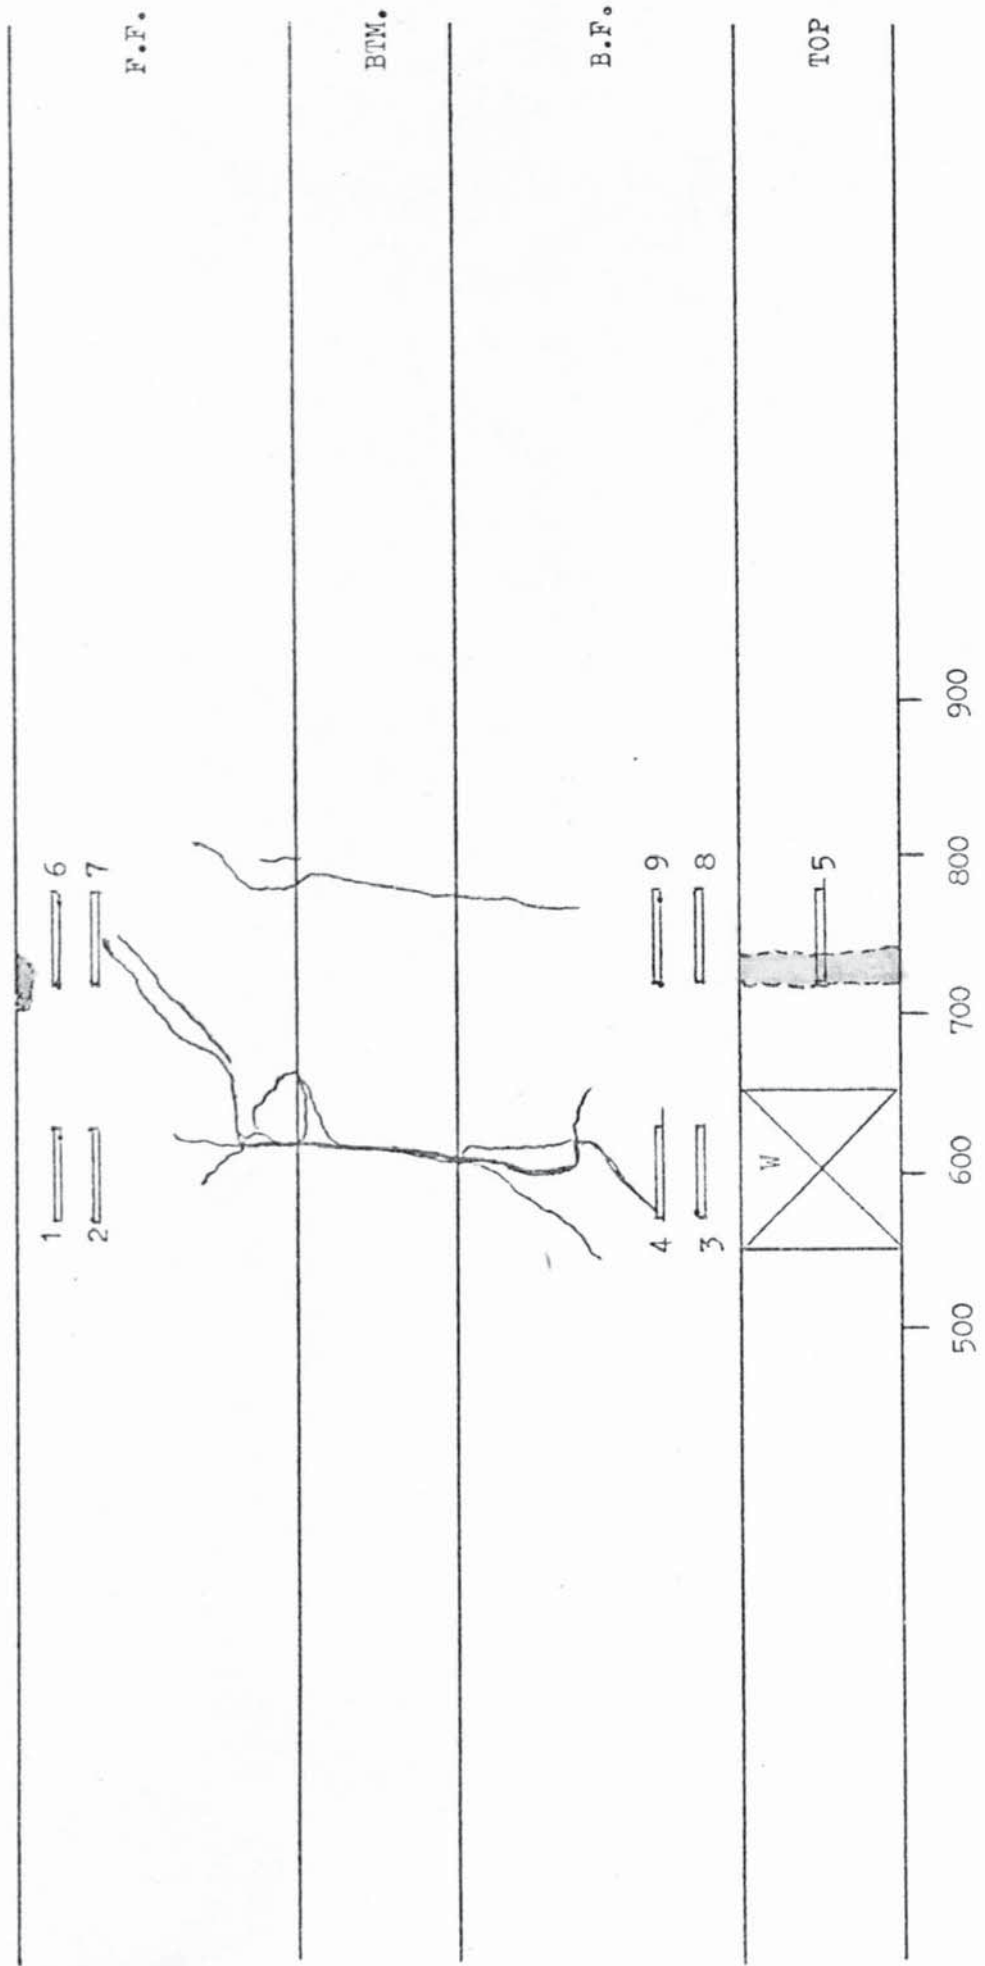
FAILURE CRACK PATTERNS - BEAM 15 (MODE 1)
